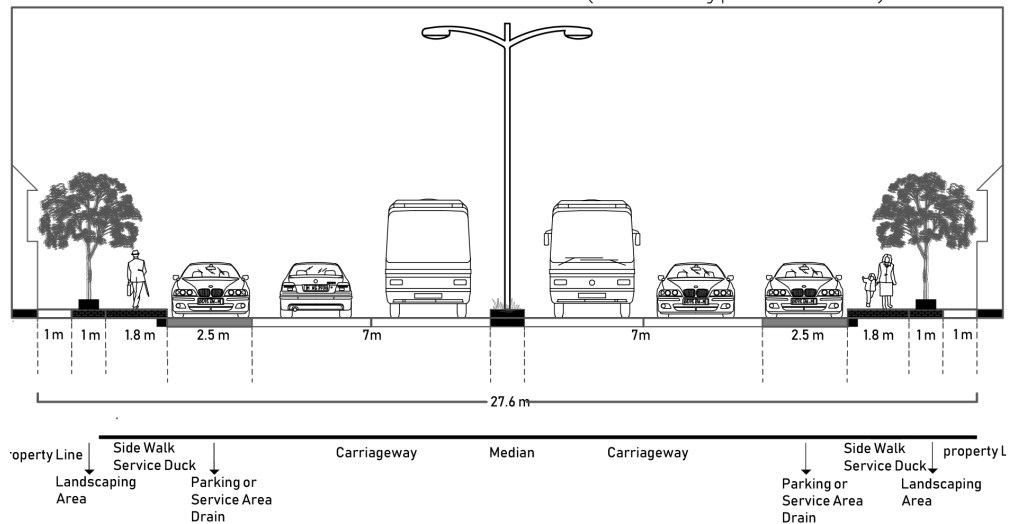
Cross section of a Level 01 – General Road - (Road Type - 1-A)
